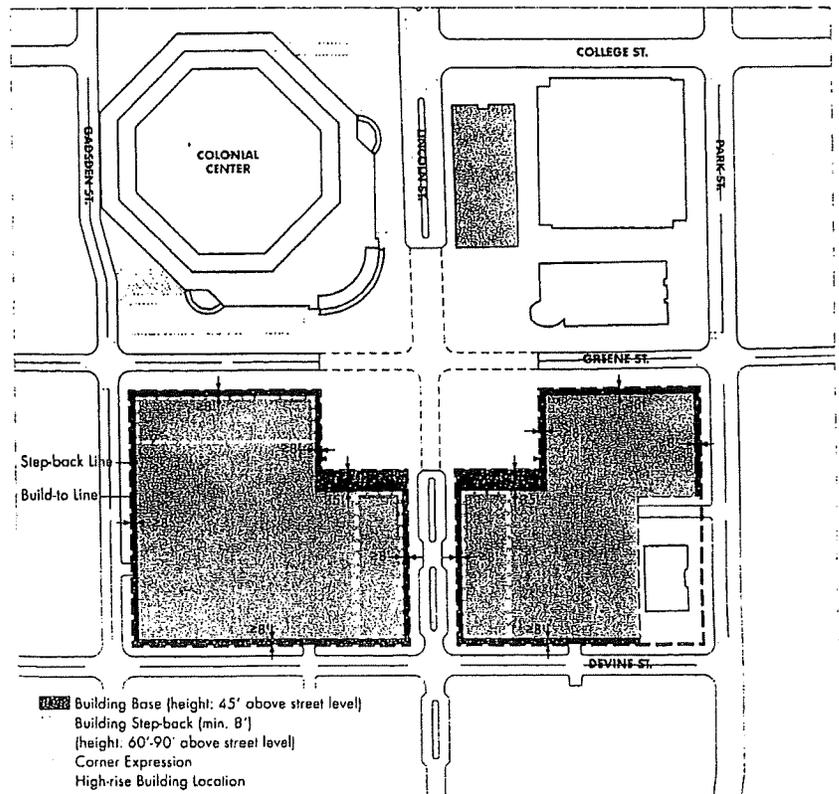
FOUNDATION SQUARE BUILDING ENVELOPE
